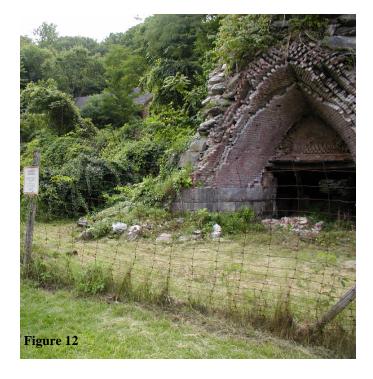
Recent image of furnace showing progressive deterioration. Note the extensive plant growth and collapsed masonry surrounding the foundation.
